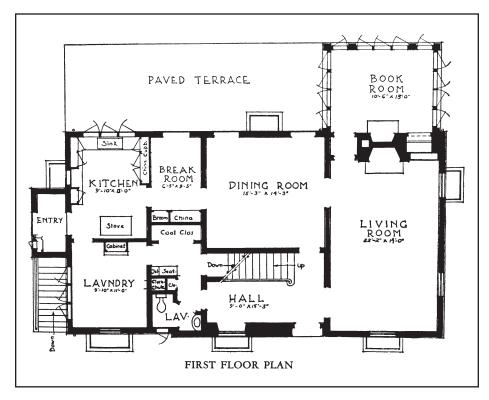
First-floor plan of the Cleaves house. From *House Beautiful*, November 1922.
